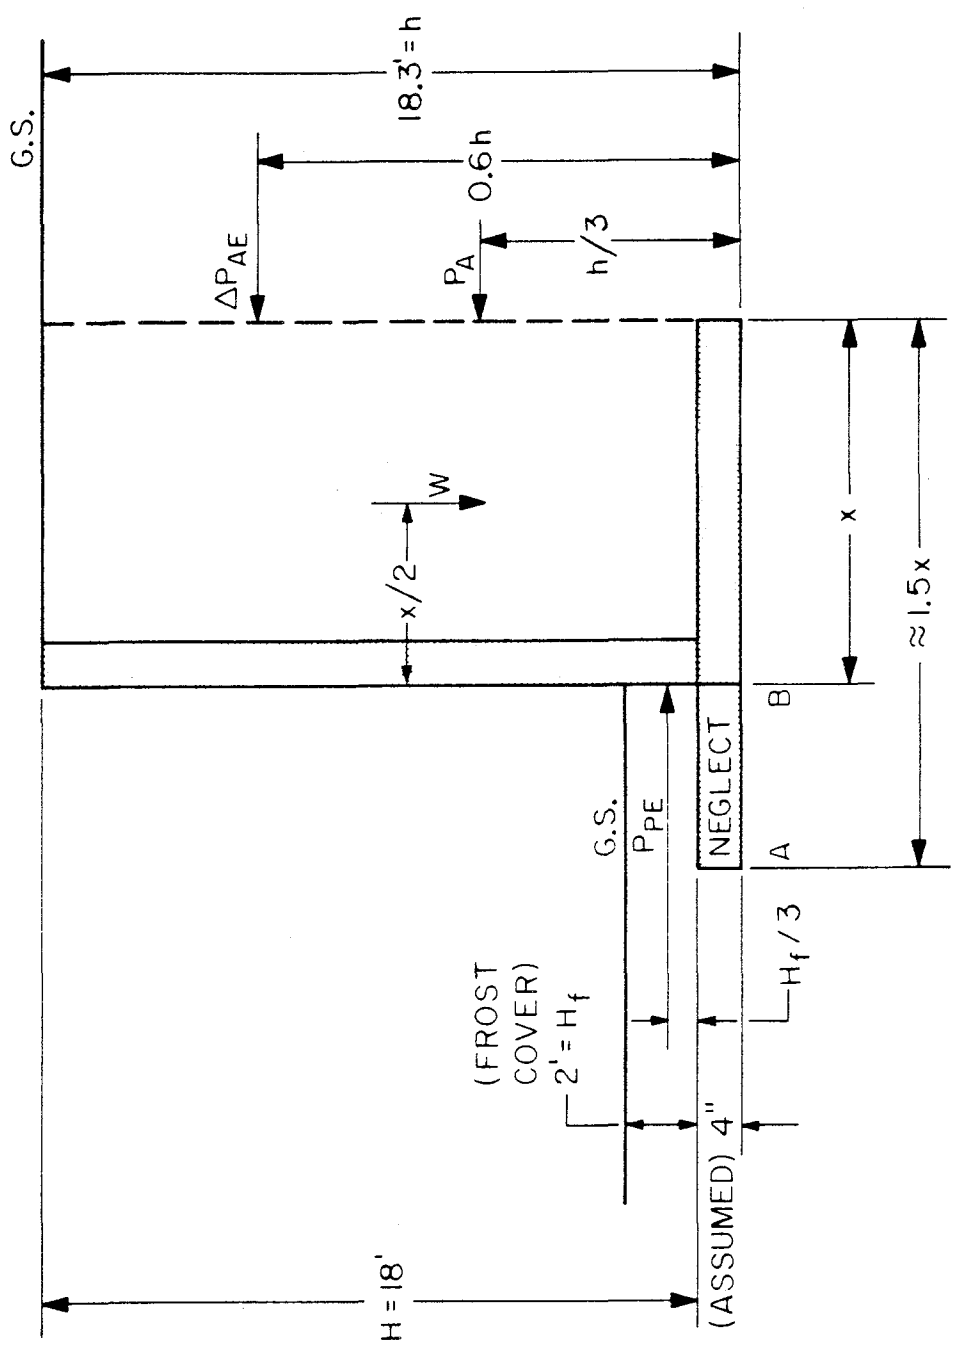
PRELIMINARY PROPORTIONING OF PROTOTYPE CANTILEVER RETAINING WALL
